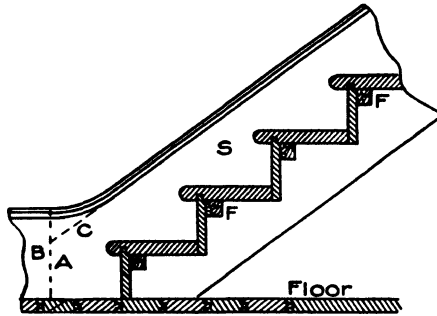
Showing How Wall String Is Finished at Foot of Stairs
